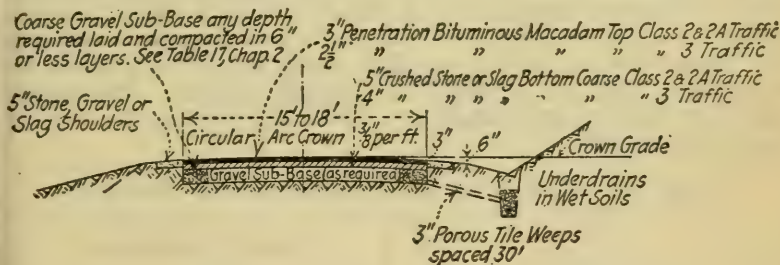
A.—Recommended penetration bituminous macadam pavement section, gravel base construction Class II, IIA or III traffic.
